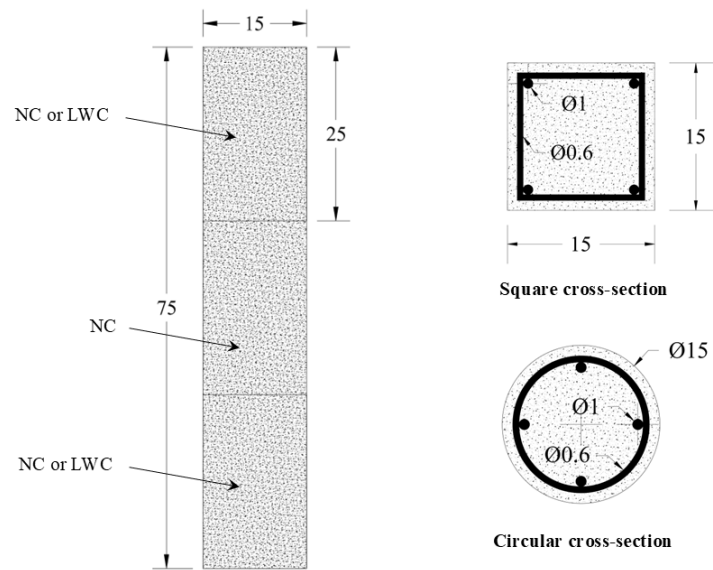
Layered RC column configurations (all dimensions are in cm)
